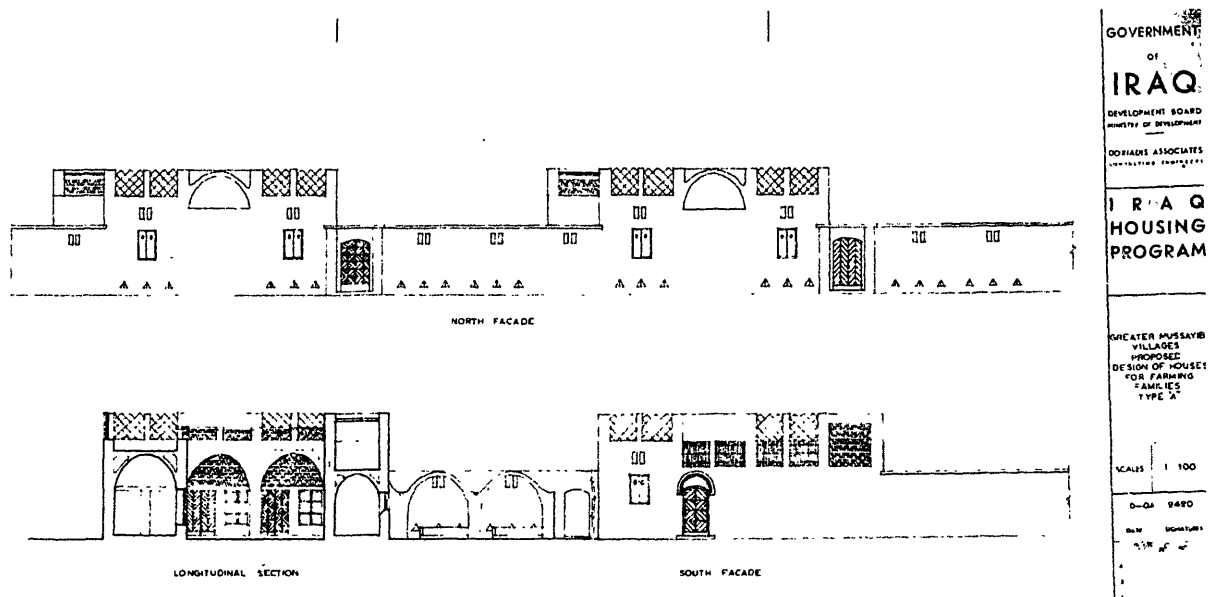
Fathy's original Elevations and Sections for Farmers housing. [HFA]
